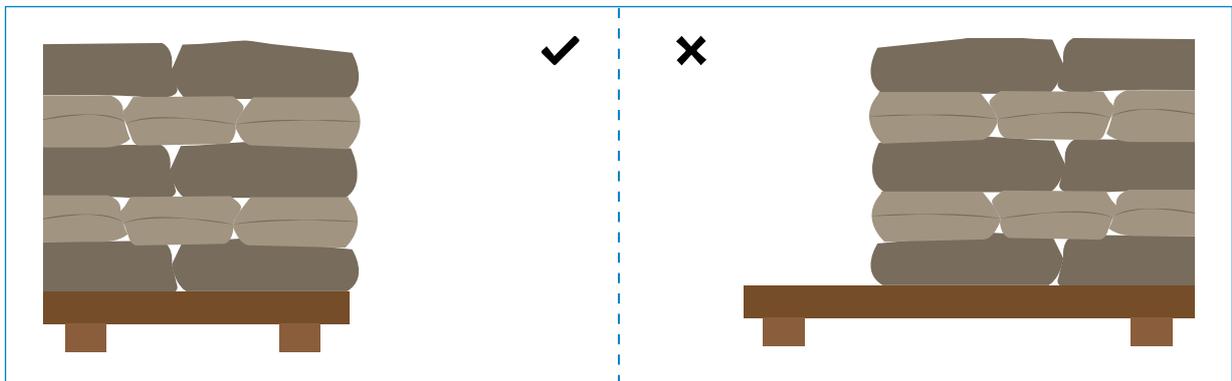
The stack should be built to give a firm bonded or interlocked stack, which will be safe.
